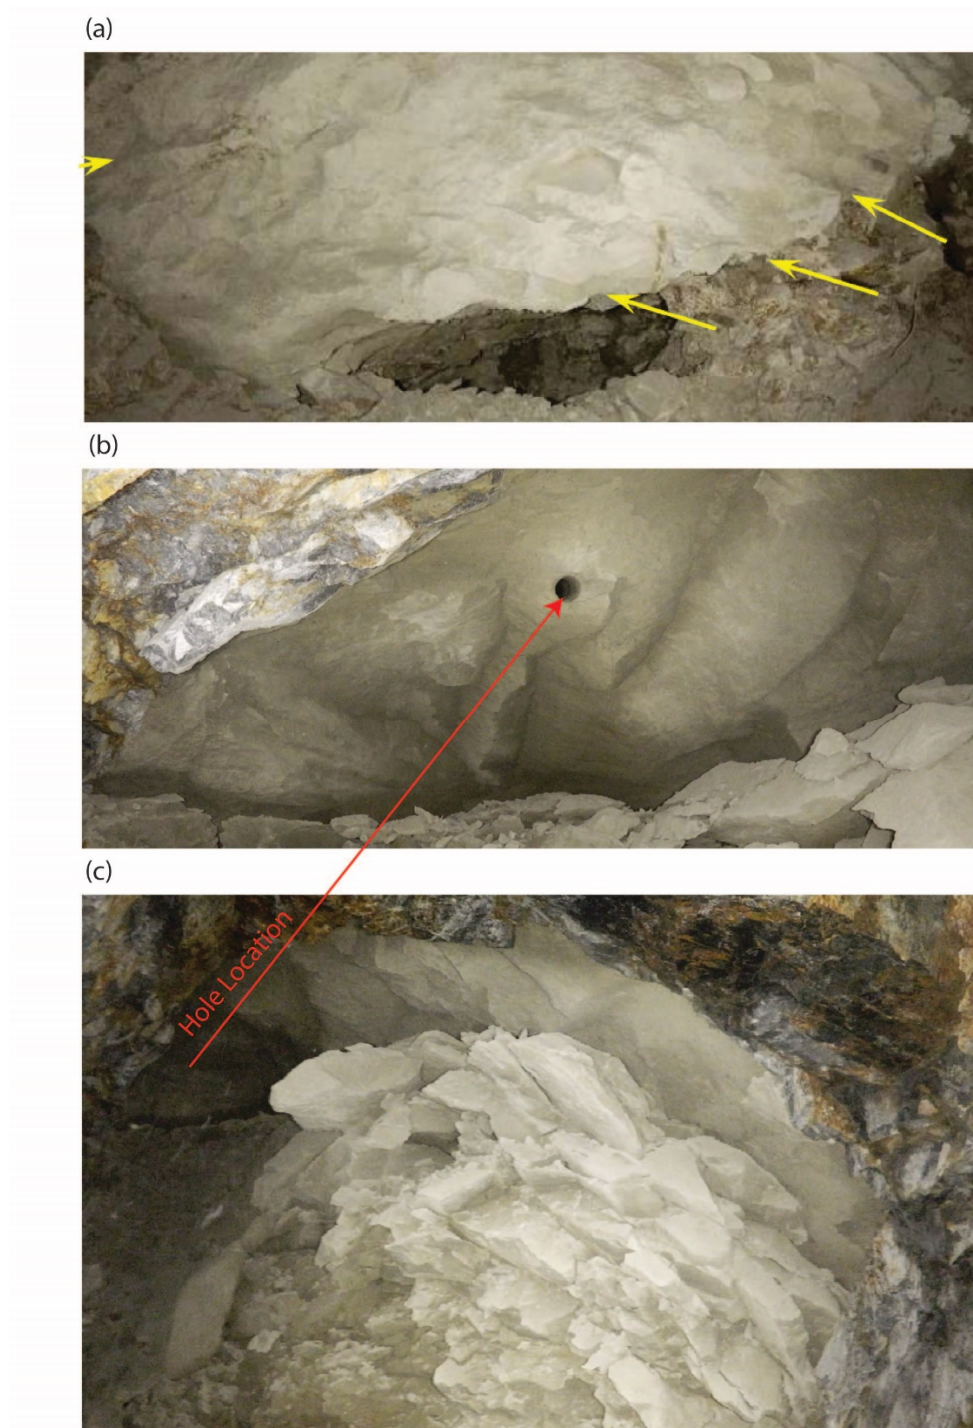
Images from Kidd mine showing structures in cemented paste backfill exposures: (a) Conchoidal fractures in paste above a void; (b) Strongly jointed paste due to induced stress and/or unloading of stress; (c) Interpreted tensile failures consistent with mining of the adjacent void
